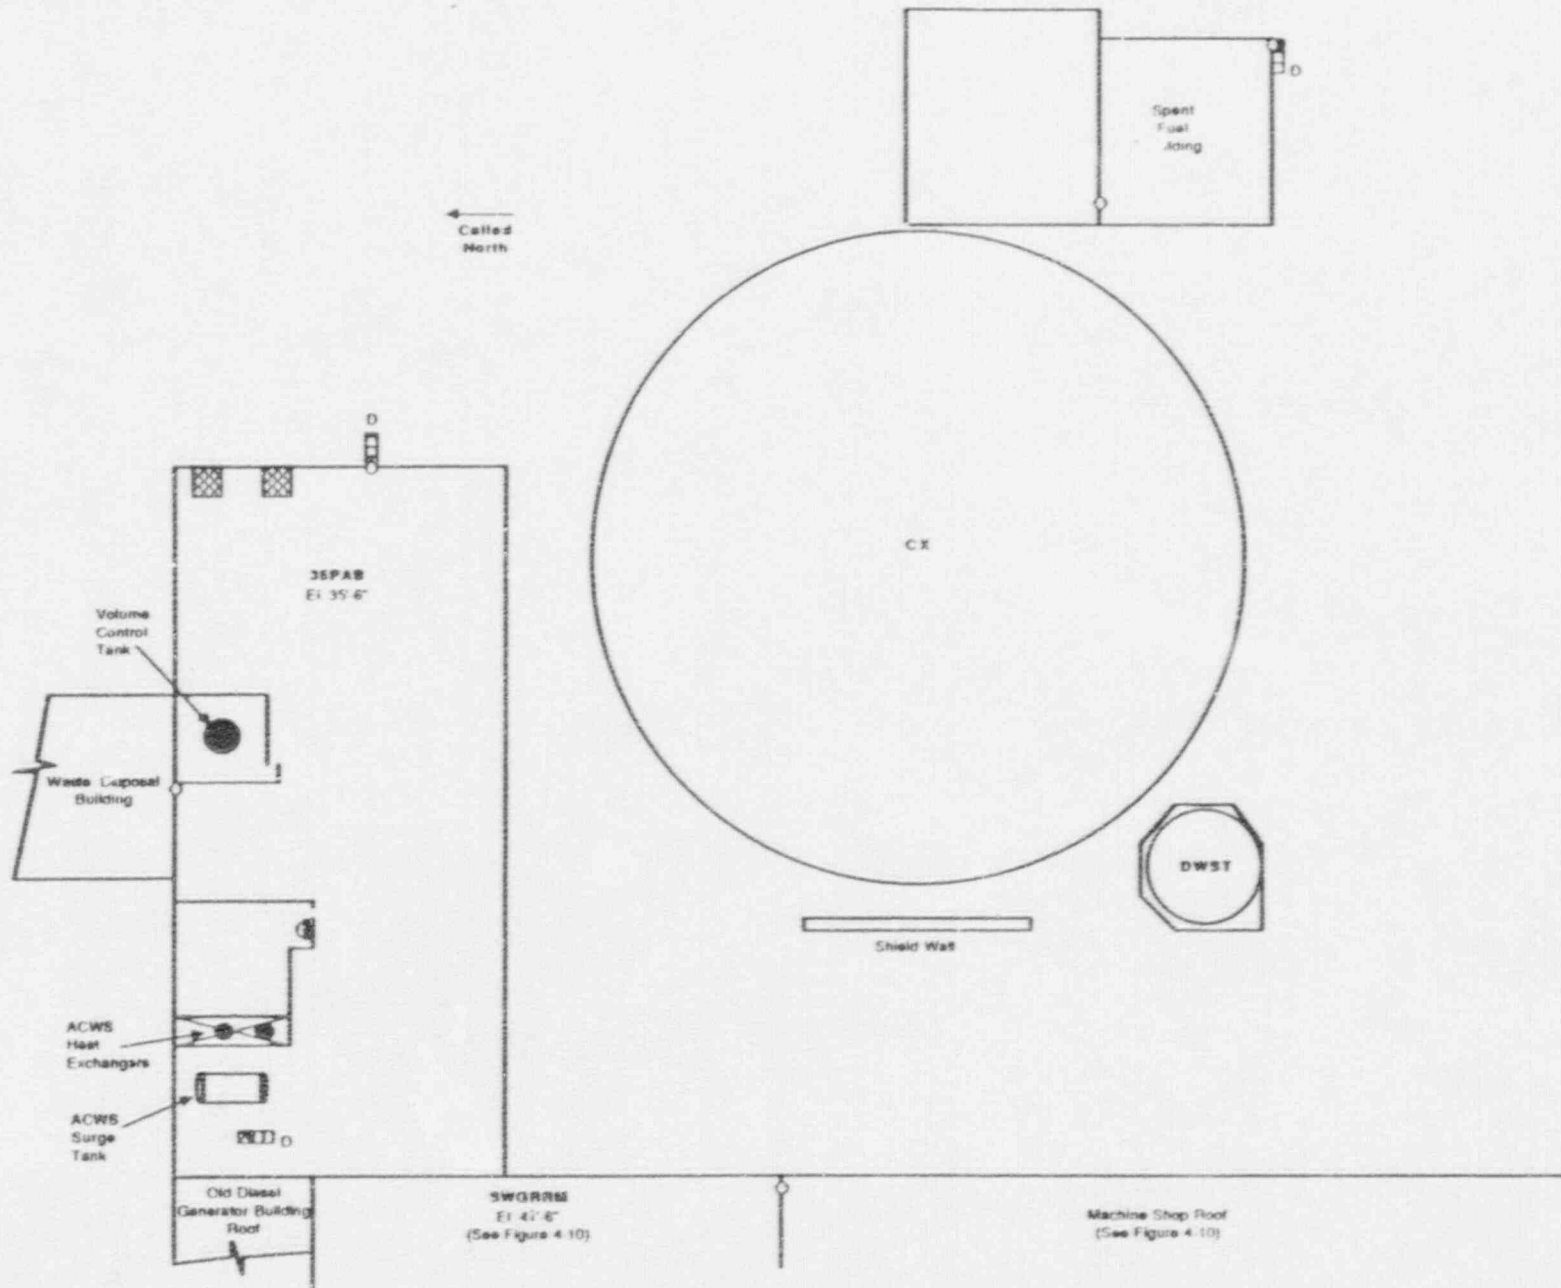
Haddam Neck Reactor Containment, Auxiliary Building, Elevation 35'-6" and Spent Fuel Building, Elevation 35'-0"
